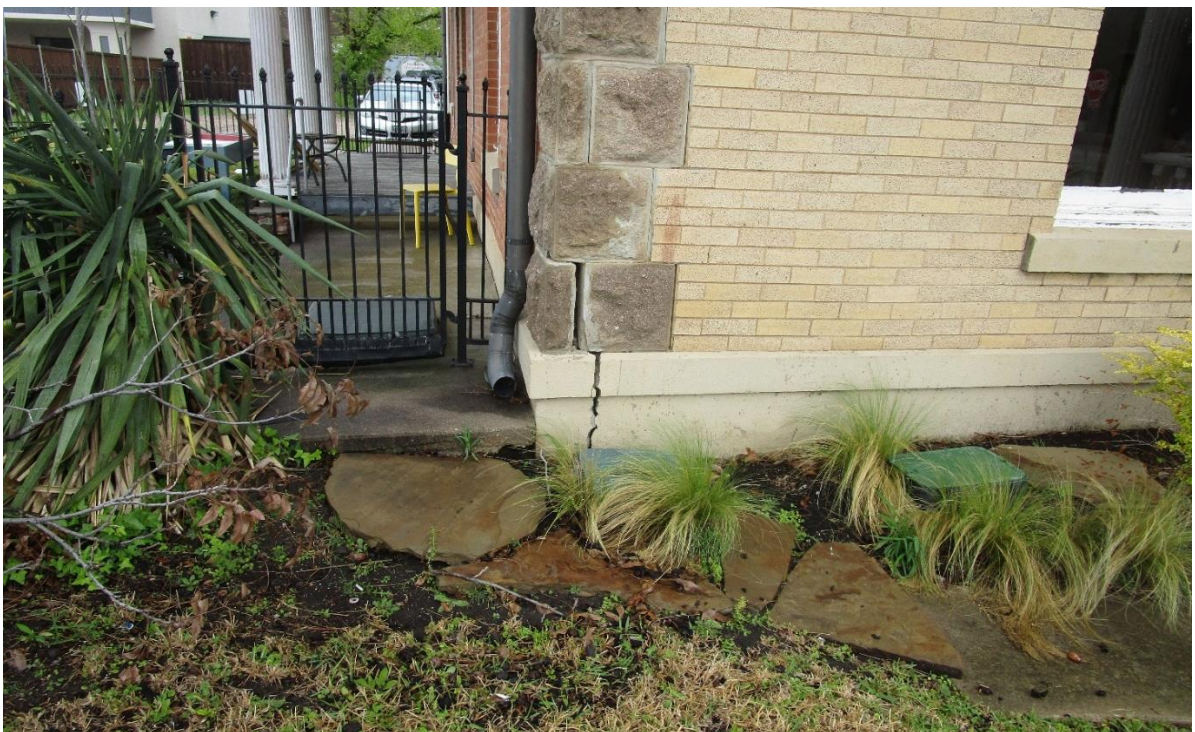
Large crack in the foundation and stone quoin at the southwest corner of the building. The crack is likely due to the downspout discharging water next to the foundation and/or the nearby large tree.
